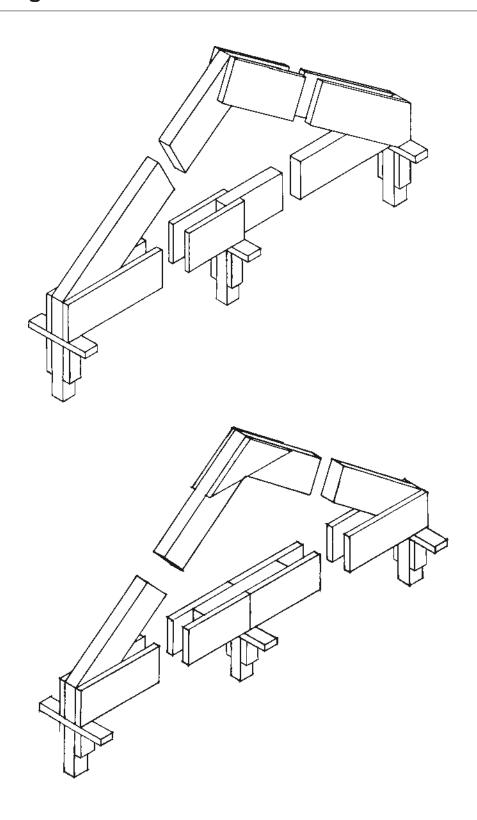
Bearing of Solid Roof Beam on Exterior Wall Post
